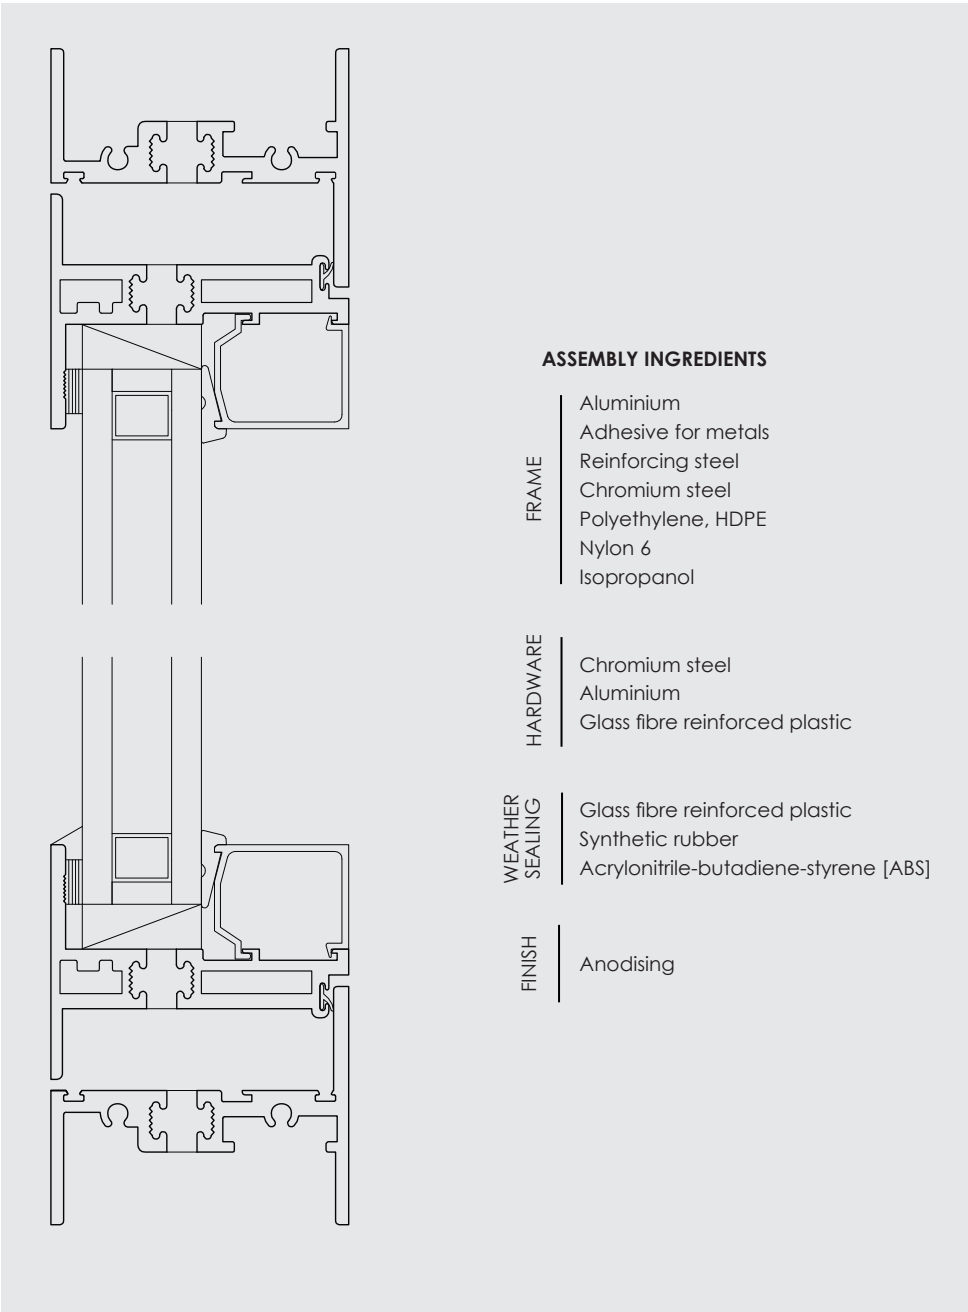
Aluminium casement window detail: section detail and ingredients list
